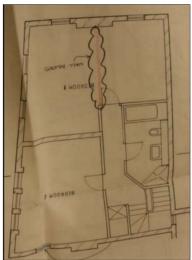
Proposed removal of the wall on the second floor of the main wing. This does not appear to have been undertaken as part of the 1990s works.
